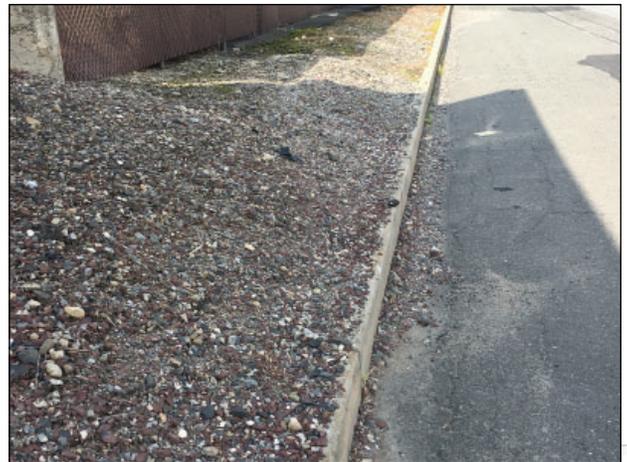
View of wall on Knickerbocker Avenue with sediment and debris falling into the public right of way and street.
